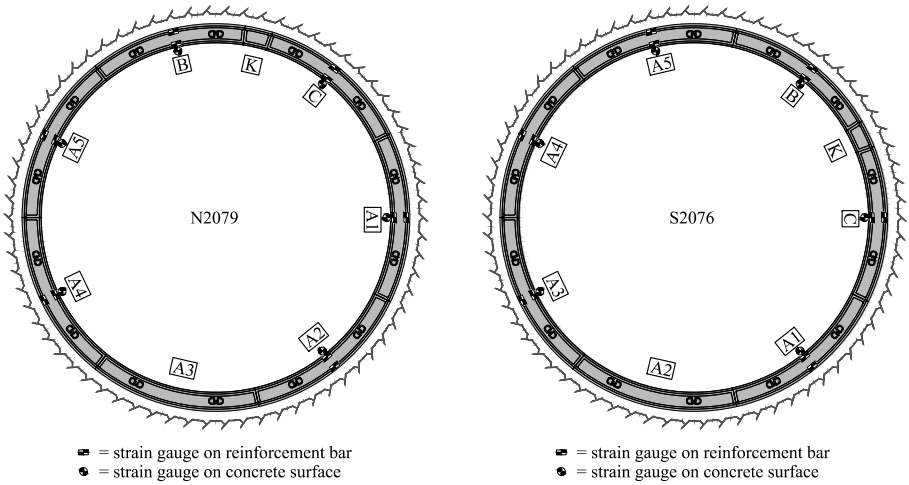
Segment orientation in tunnel sections N2079 and S2076.
